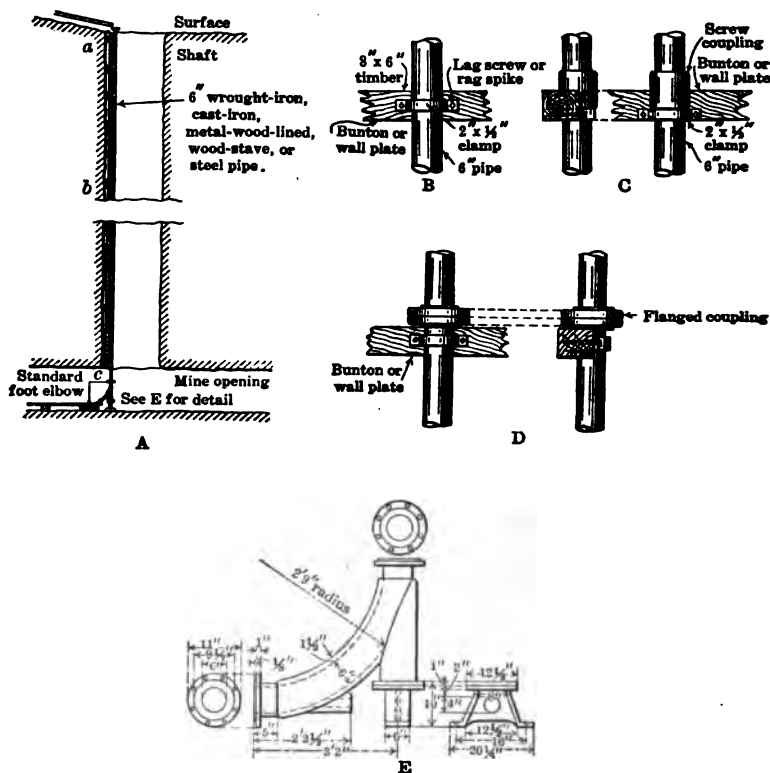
Methods of pipe arrangement in intermediate transportation. A, sectional view of pipe line in shaft; B, detail of clamping at a; C, detail of clamping between couplings at b, front and side elevations; D, detail of clamping at couplings at b, front and side elevations; E, detail of foot elbow for filling-pipe standard at c.
